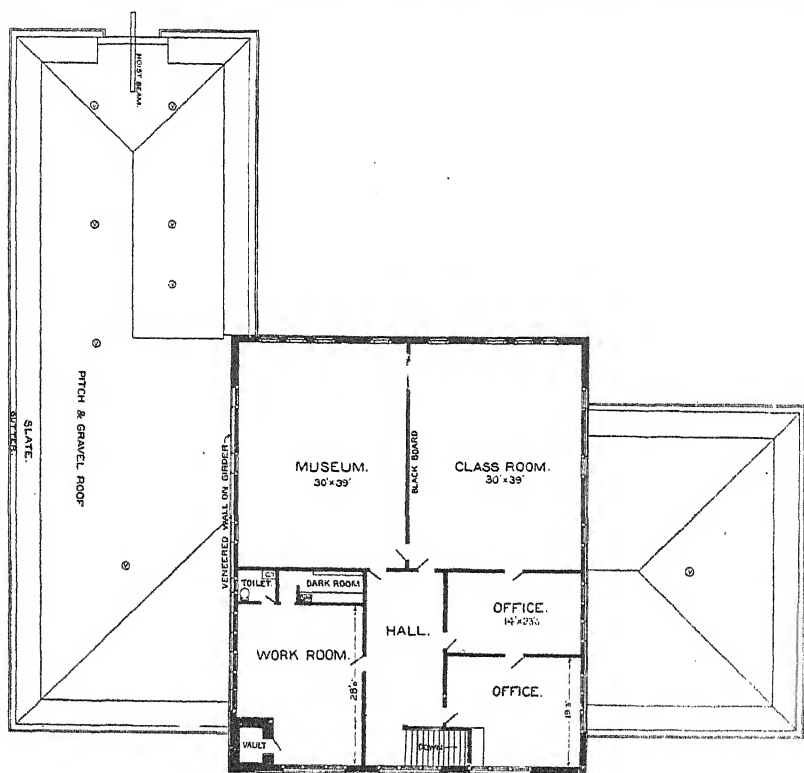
Second-floor plan, live stock building, Minnesota College of Agriculture.
